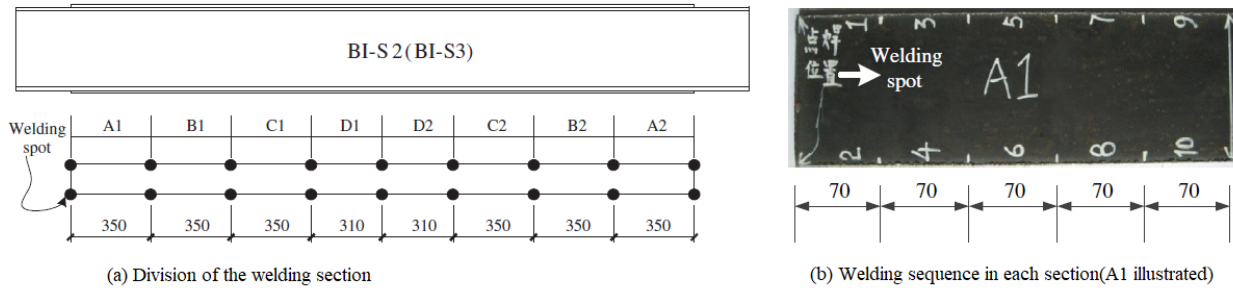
(a) Division of the welding sections, (b) welding sequence in each section Liang et al. (2015).
